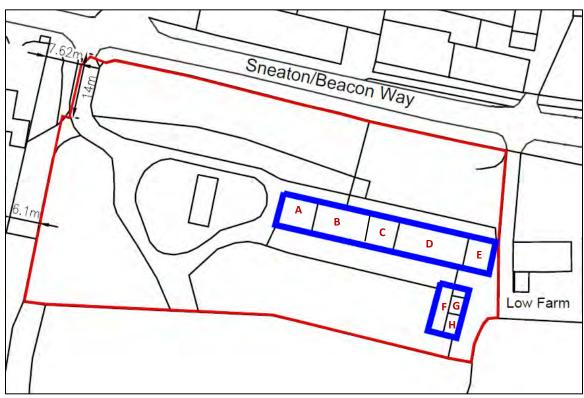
Site layout with red line highlighting the site boundary and blue outline around buildings included within the survey.
